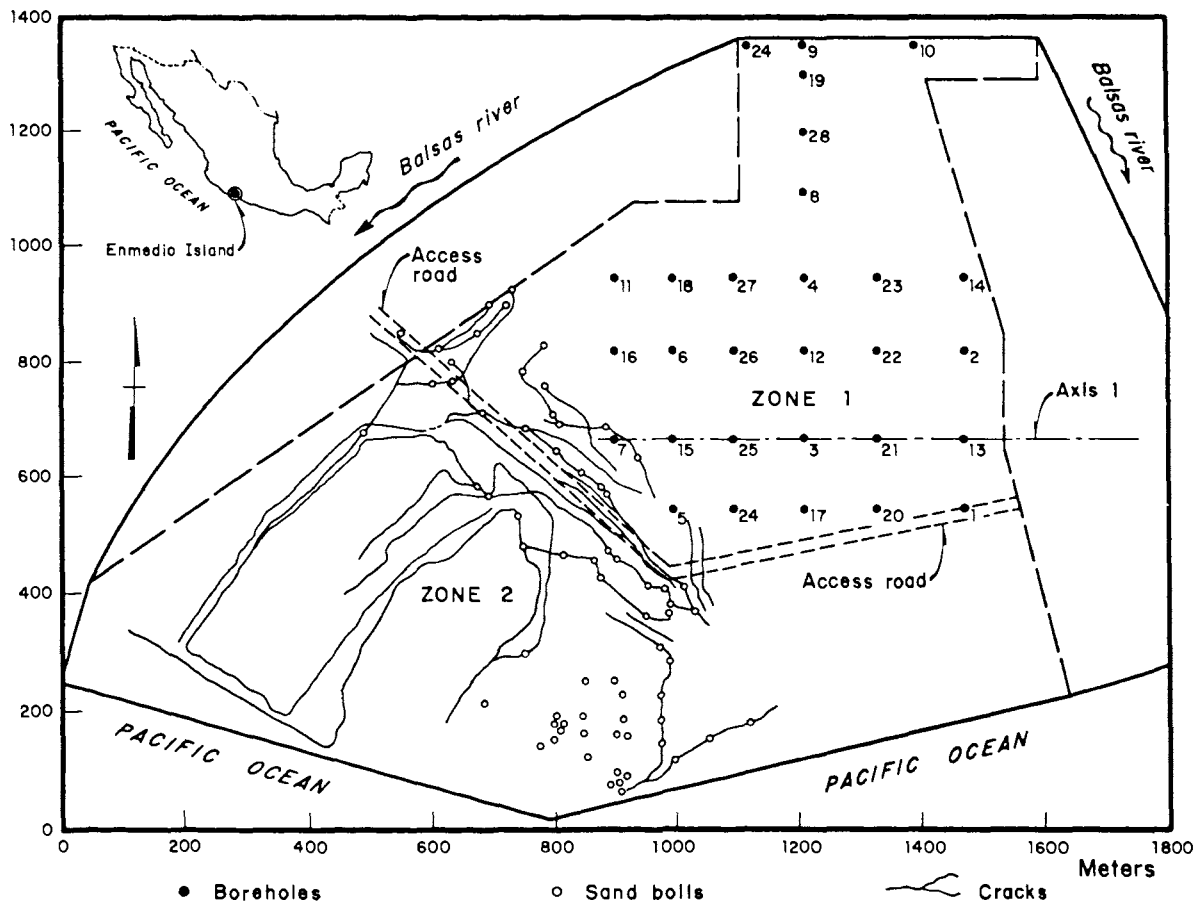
Plan view of the site. Boring location and observed damage cracks and sand boils
